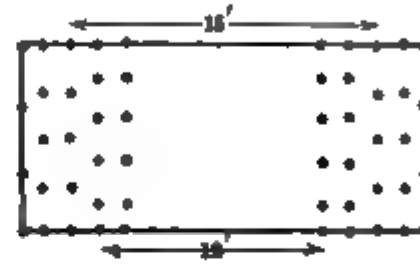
The Ten-foot Centre Cut for Shaft-sinking.
